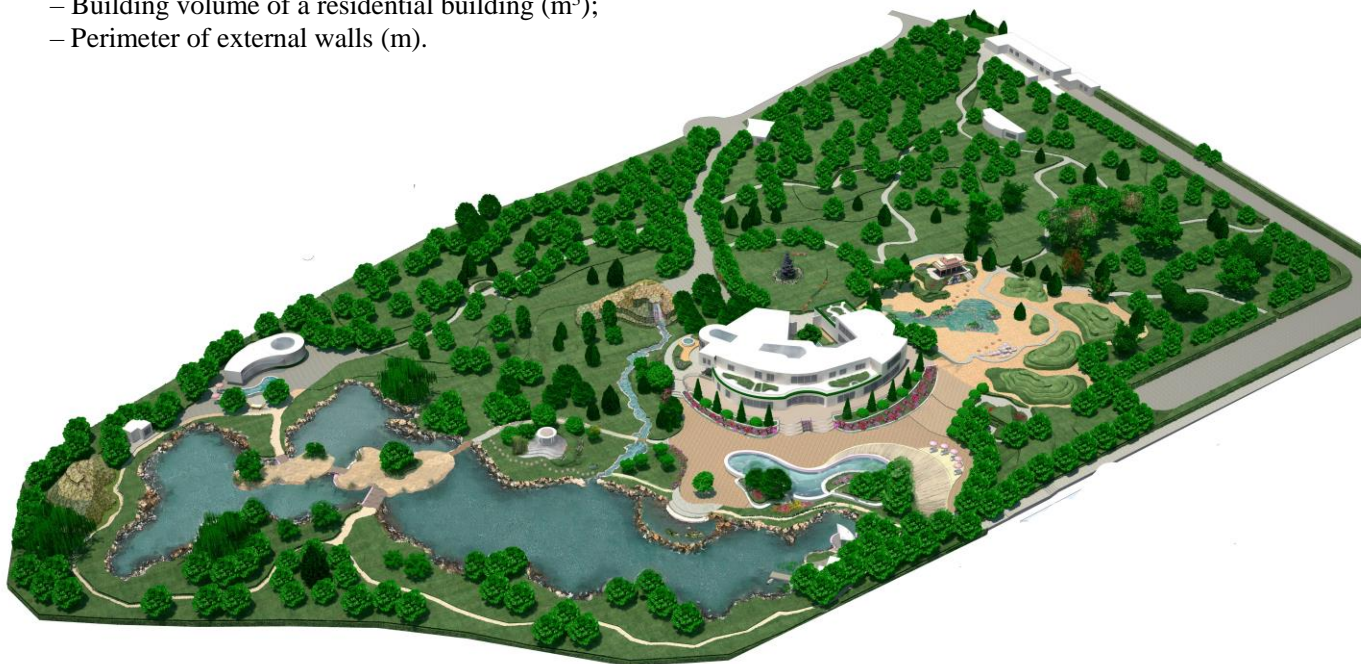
Examples of rendering visualizations of a modern residential building and its adjacent territory from a bird's eye view
